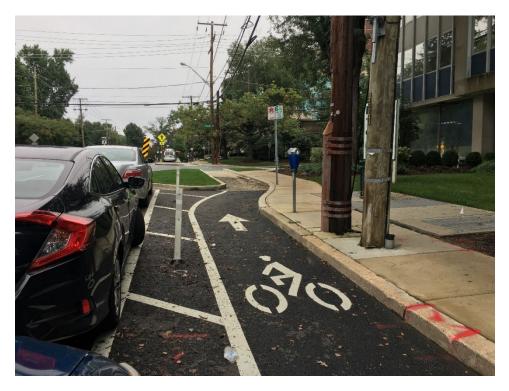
Spring Street / Cedar Street Separated Bike Lanes
